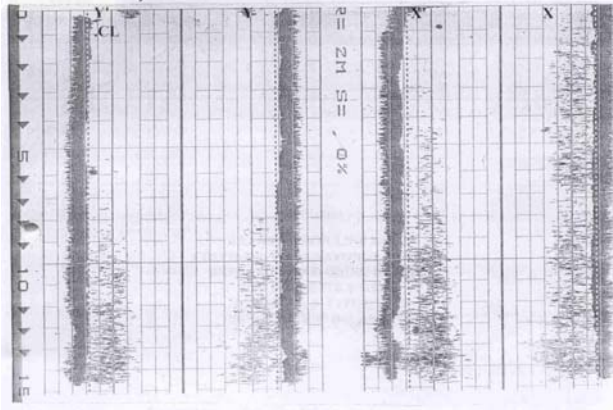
Trench profile of a cruciform barrette recorded with Koden equipment - Tower no. 5
